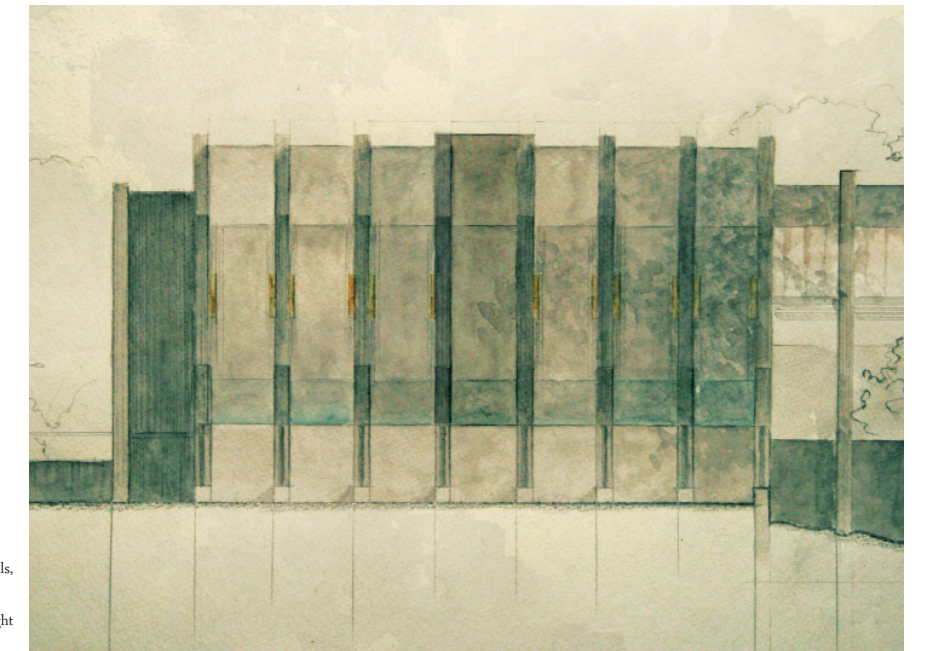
bottom. North elevation showing narrow pierces along each niche to bring northern light for reading. The center niche brings in southern light from the top.
